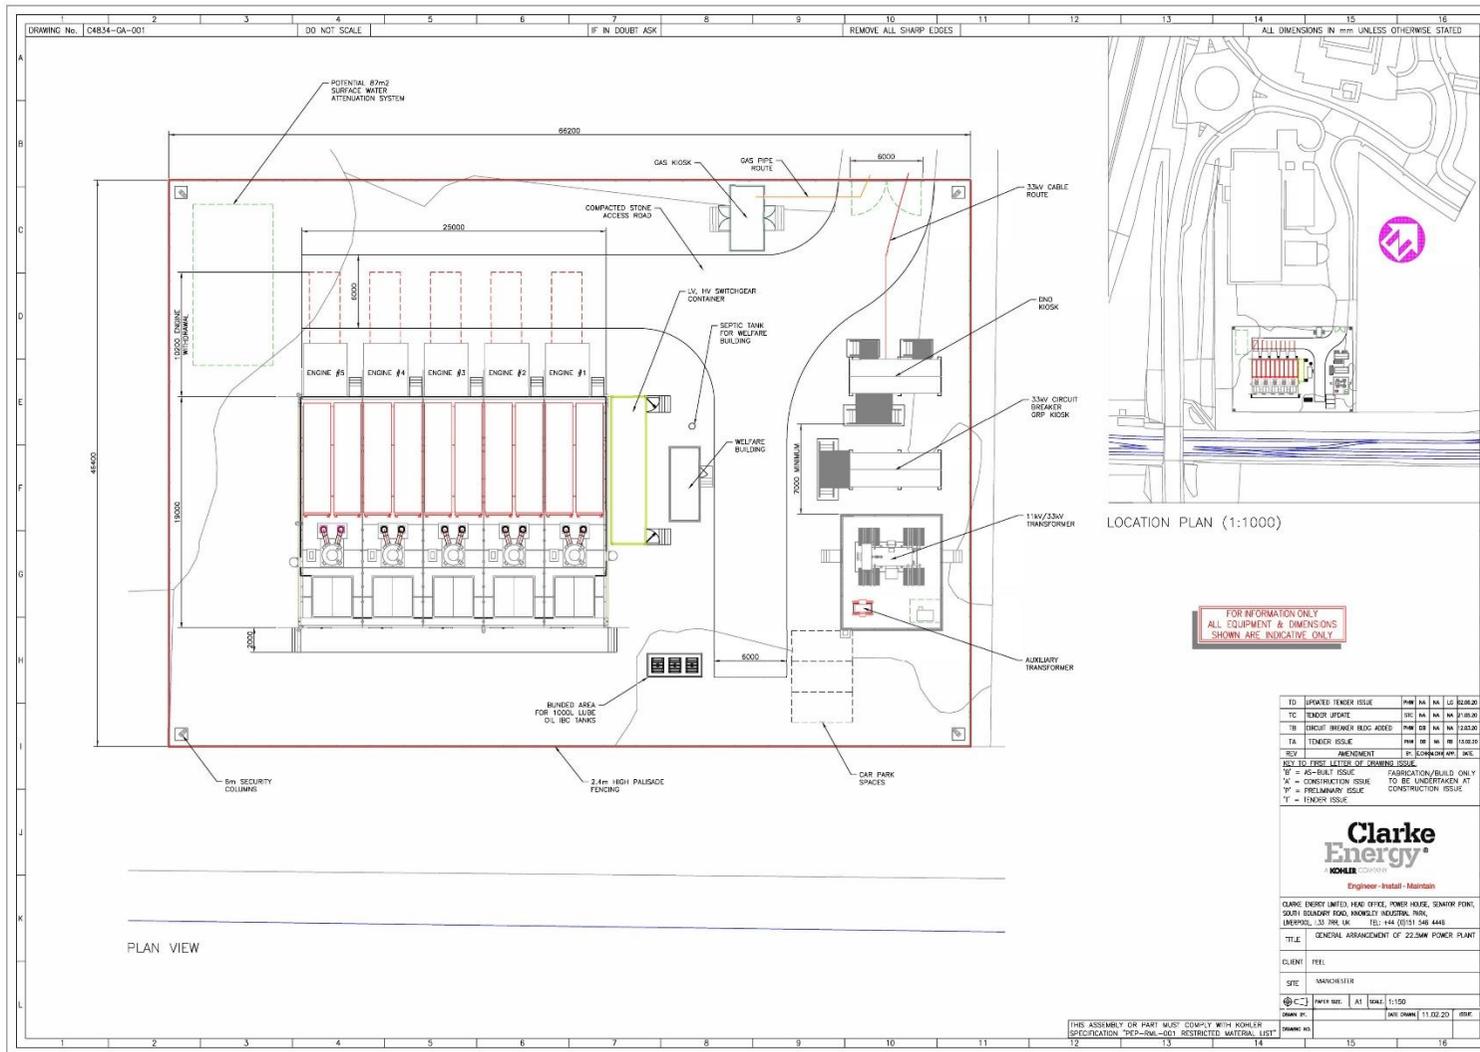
22.5MW<sub>el</sub> Typical Powerhouse Layout - Plan
